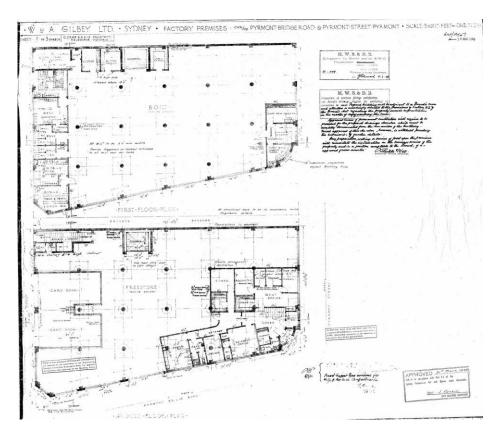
1948 – Amended ground and first floor plans for the proposed factory premises for W & A Gilbey Ltd by C. Orme, architect, Melbourne, approved 31 March 1948 (Source: City of Sydney Archives, Pyrmont Bridge Rd NW cnr & Pyrmont St (adjacent No 135), new building (01/01/1947 - 31/12/1947), [A-00572010].
